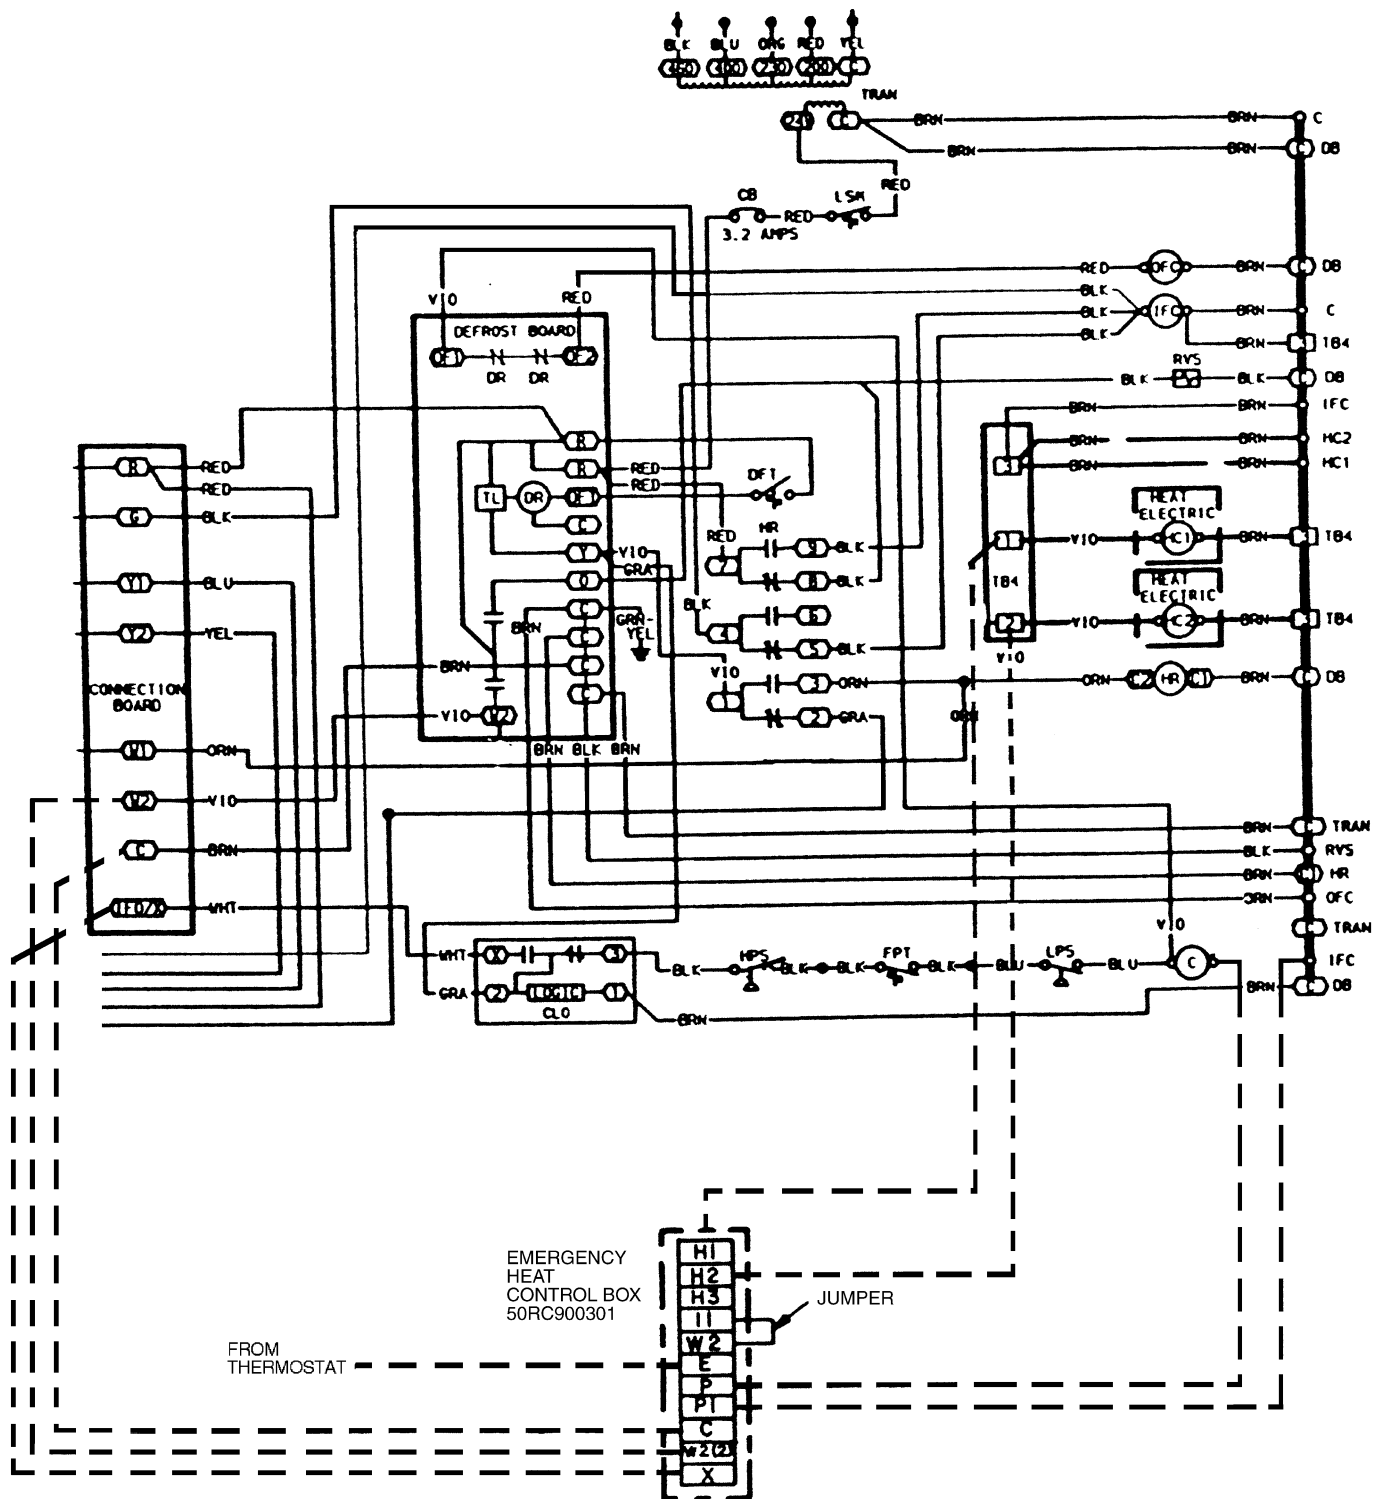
Emergency Heat Control Wiring With 2-Stage Electric Heater and Single Compressor, 50TFQ004-007
